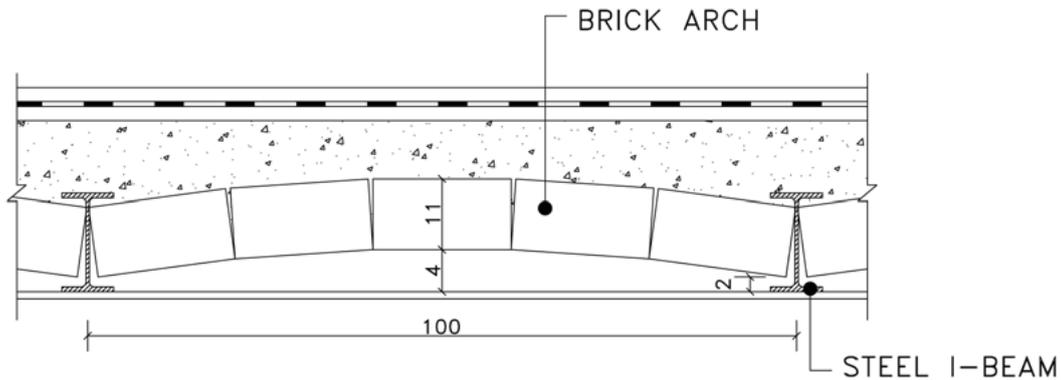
A typical section of steel I-beam jack-arch flooring system (length dimension is cm).
